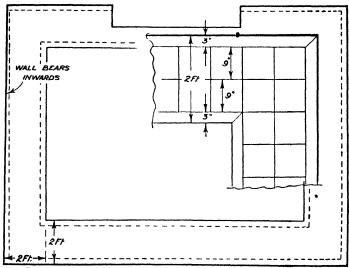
How Room is Marked Out for a 2-ft. Surround.
